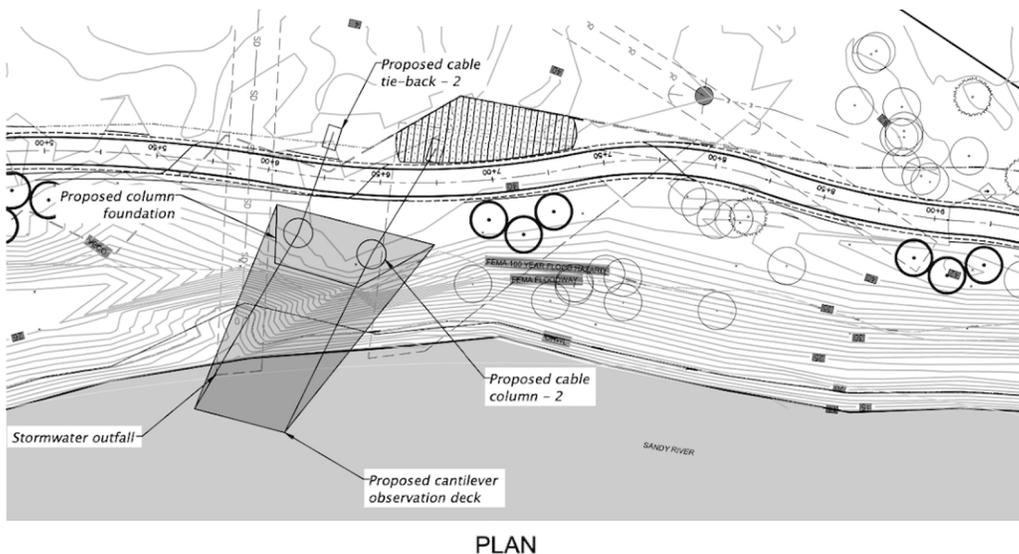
Plan view of the proposed large cable-stayed deck design
